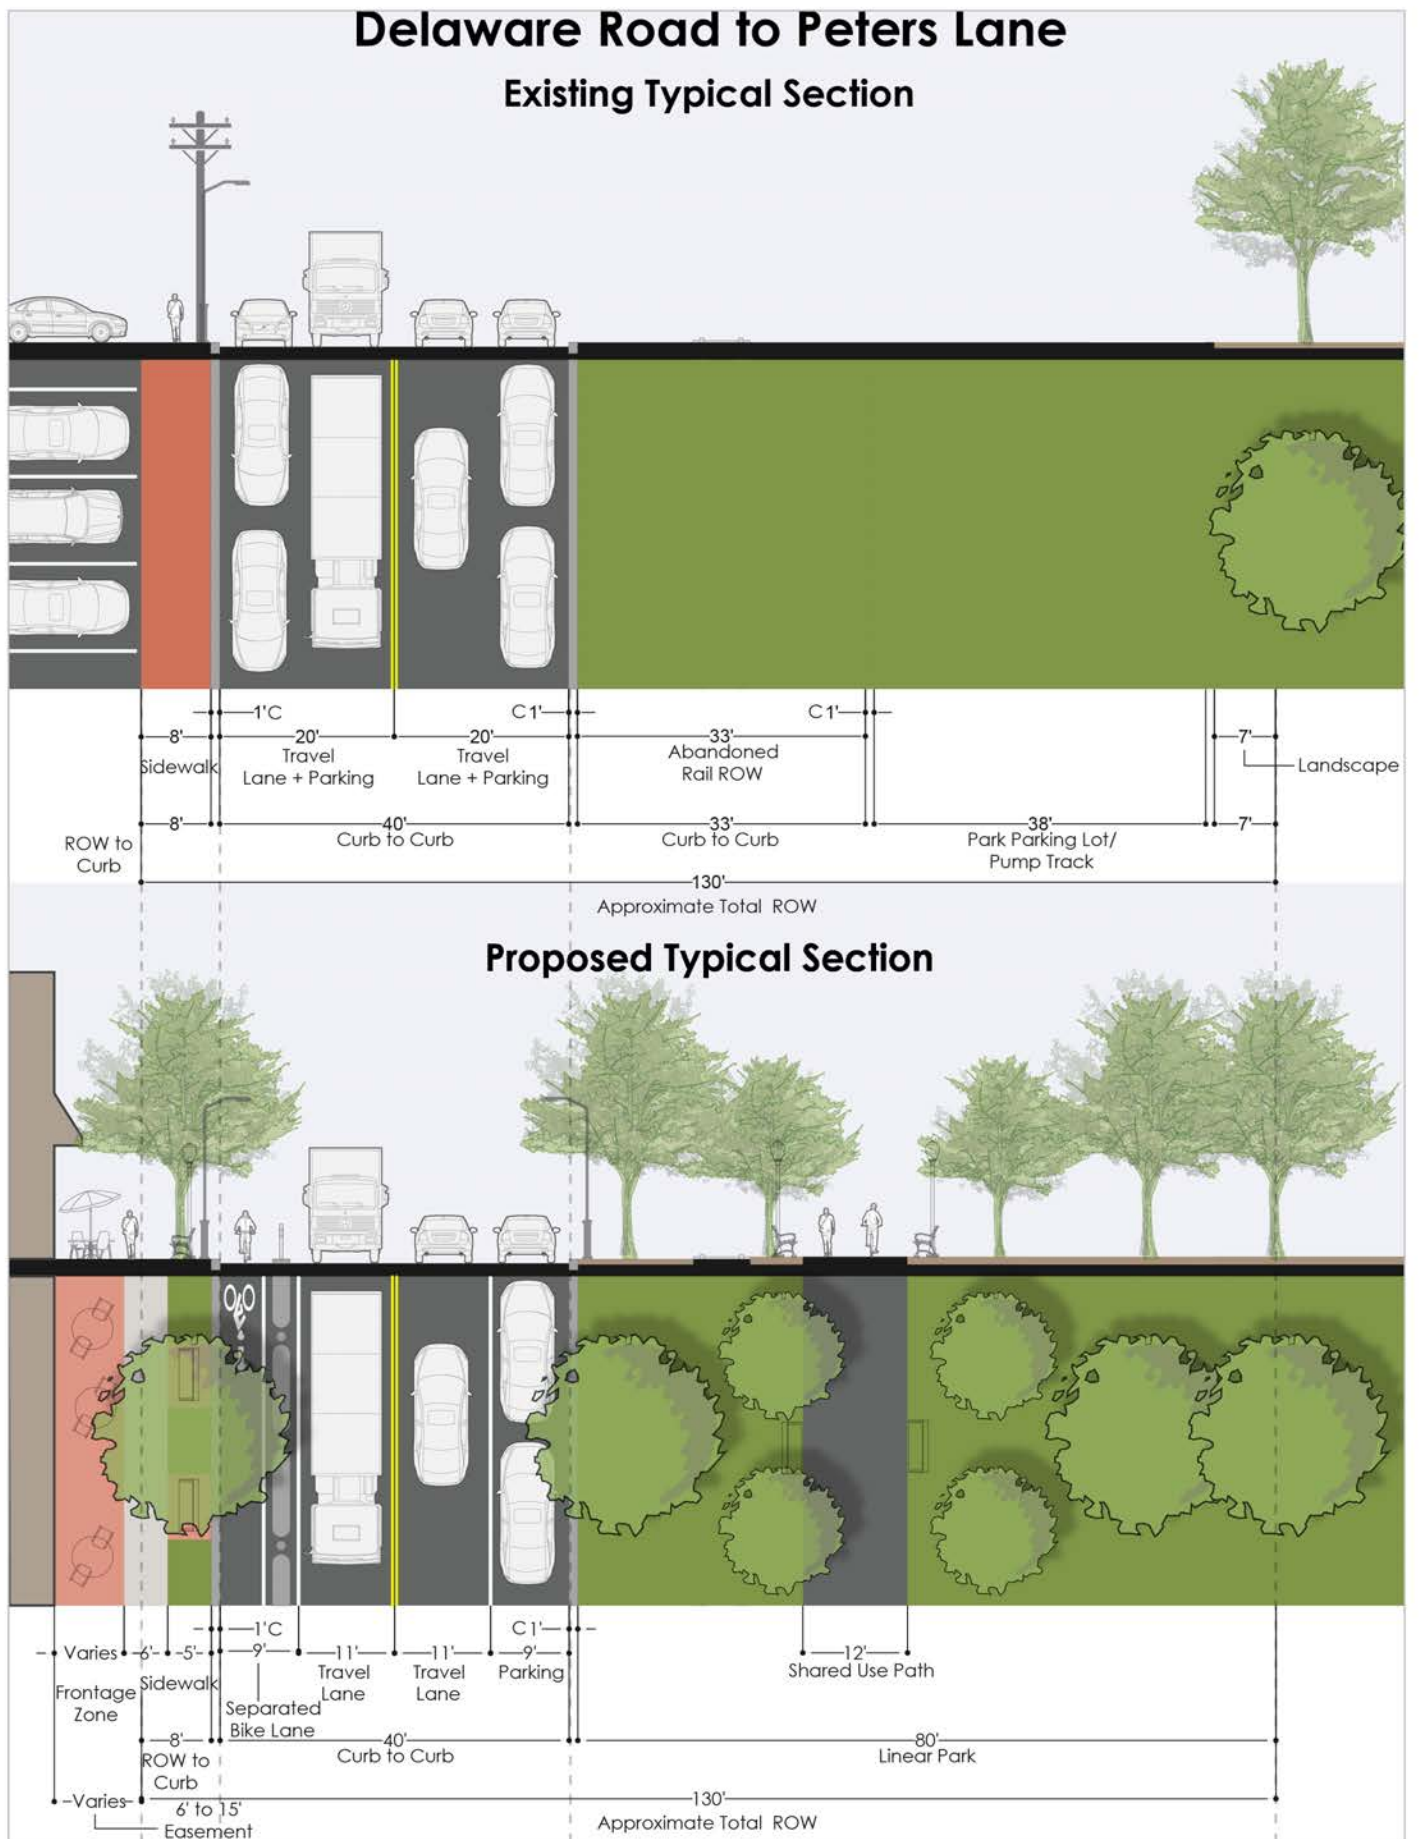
Existing and Proposed Typical Section - Delaware Road to Peters Lane
